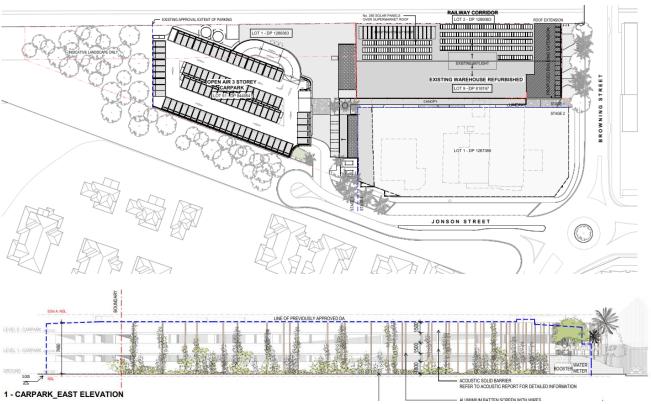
Proposed Site Plan and Car Park Elevations to Jonson Street
